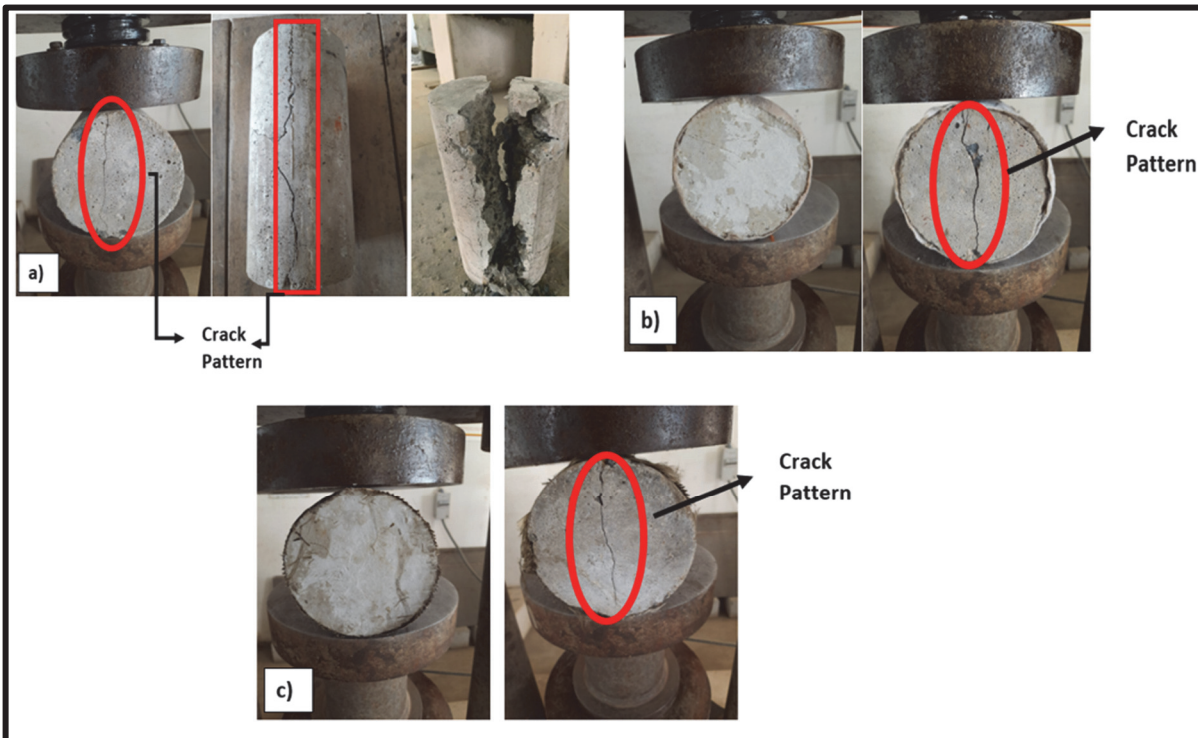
Cracked samples under split Tensile Test (a) pristine concrete (b) Geo-Textile wrapped concrete and (c) Basalt fiber wrapped concrete.
